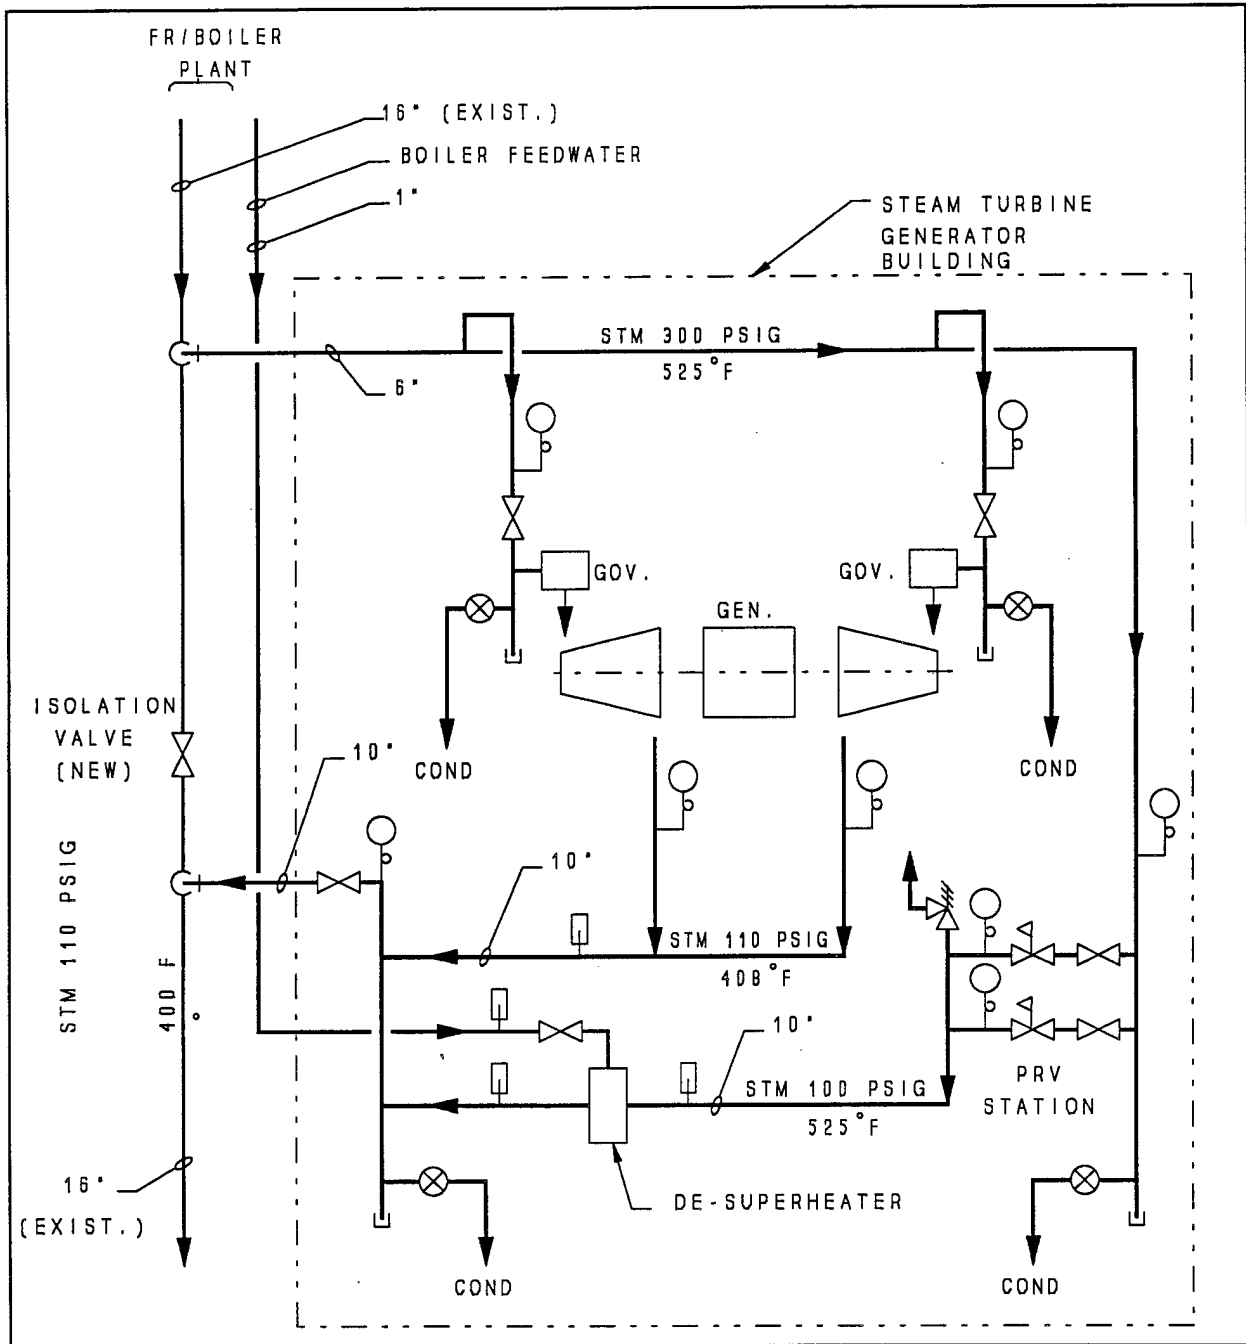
SYSTEM PIPING SCHEMATIC
